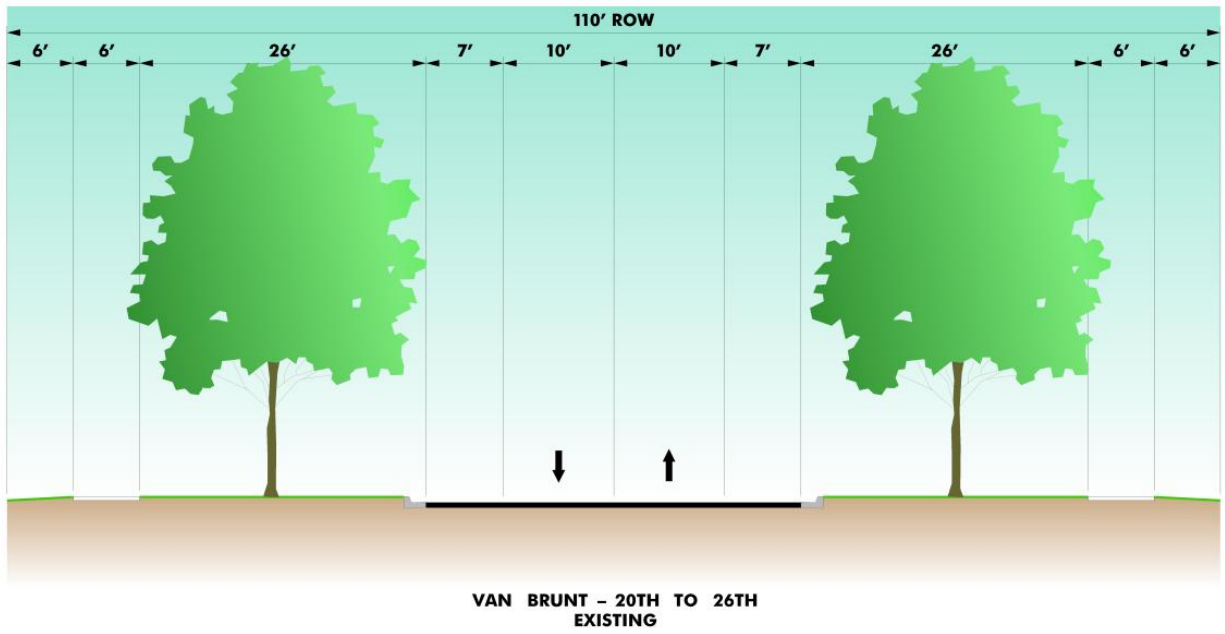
Enhanced Streetcar Truman Road Alignment Typical Section - Van Brunt 20th-26th Streets Existing Conditions
